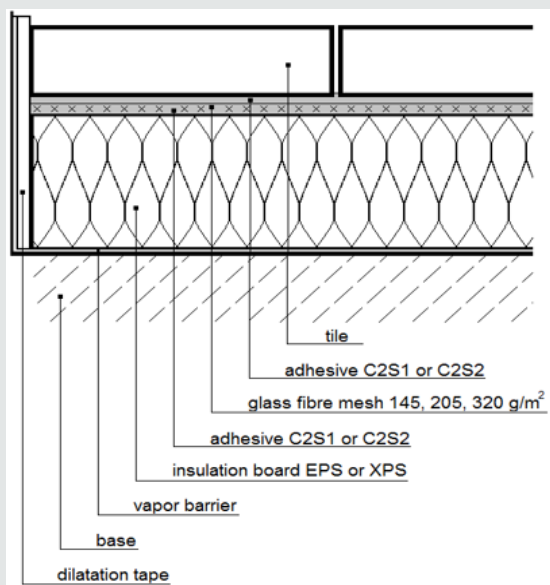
Cross-section of a lightweight floor system with XPS or EPS thermal insulation.
